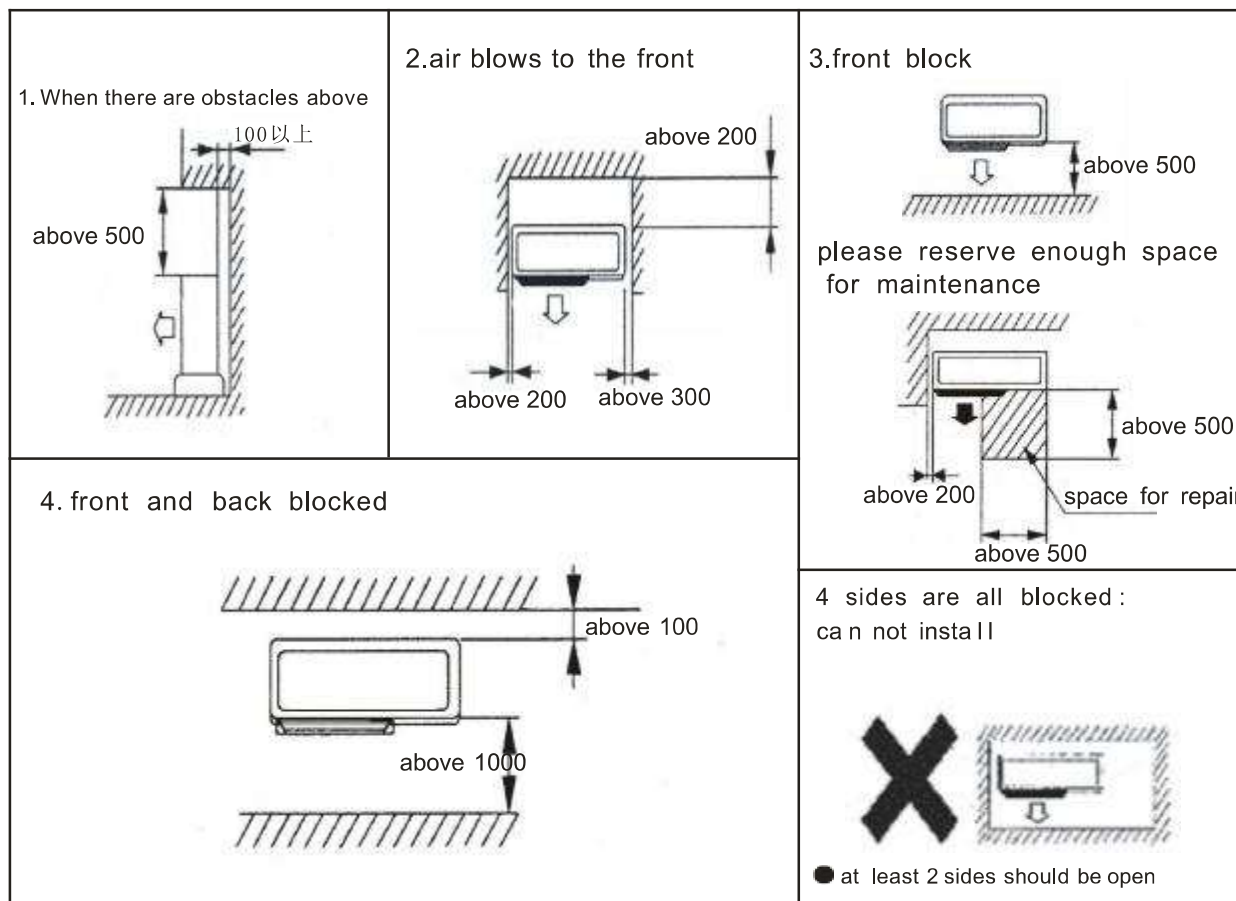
Horizontal type installation space, side air outlet (units: mm)
